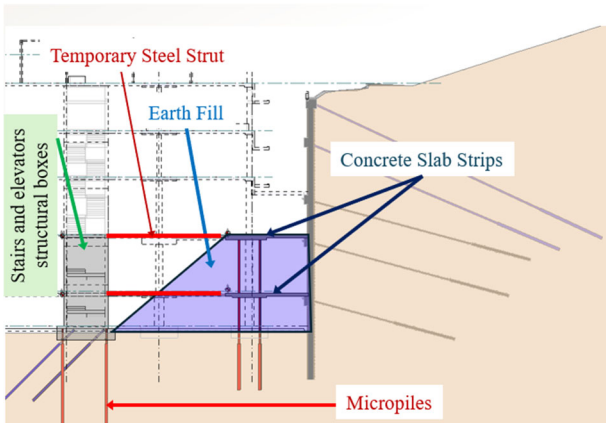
Cross section of the implemented reinforcement measures at the East side wall.
